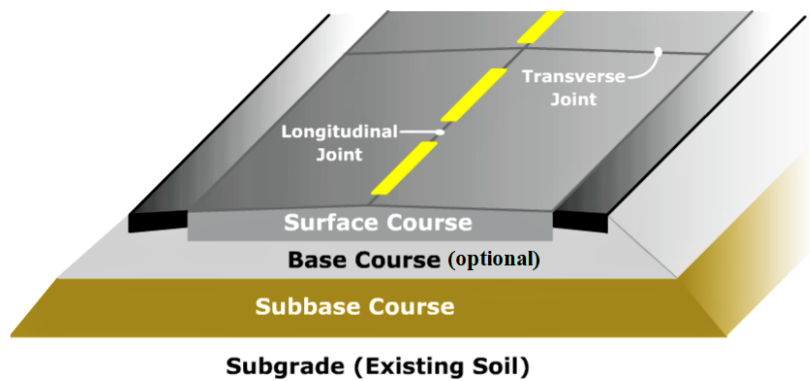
Typical Cross-Sections of Rigid Pavement
